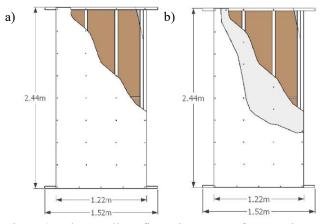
Shear wall configurations – CFS frame and gypsum panels: a) one layer of gypsum on both sides, and b) two layers of gypsum on both sides
